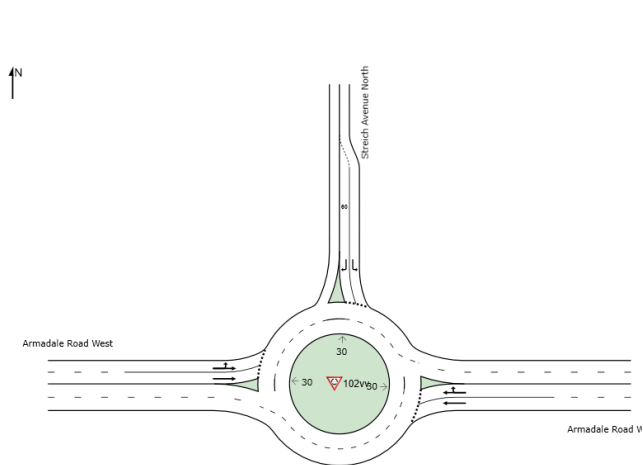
Armadale Road/ Streich Avenue – Roundabout option
